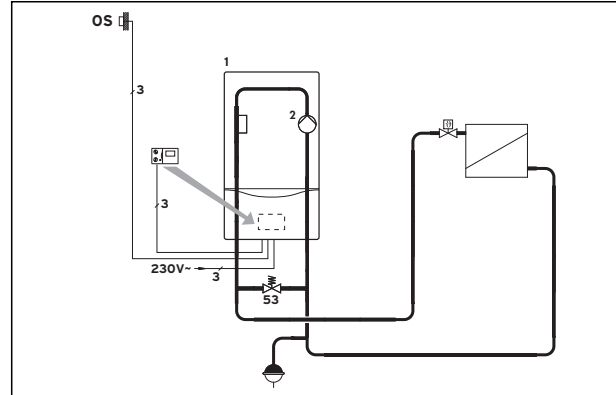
Example 1: radiator heating, direct feeding, integral boiler pump
